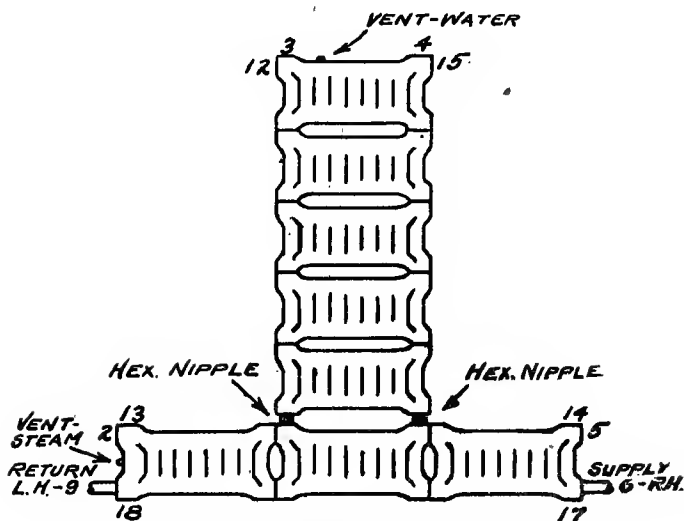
Assembled in single tier and single stack. Water or one and two pipe steam.
